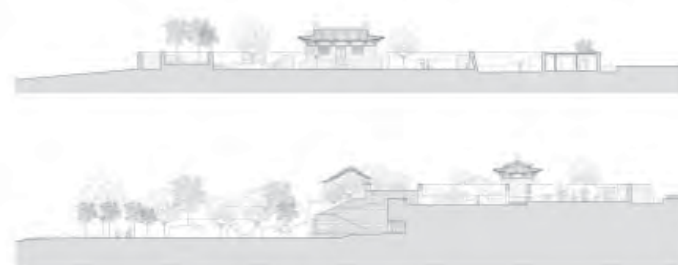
Five Dragons Temple Site Sections (ArchDaily, 2017)
